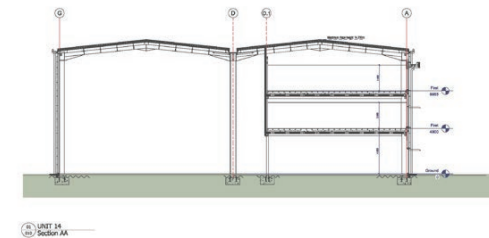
UNIT 14 GA SECTION - NOT TO SCALE
